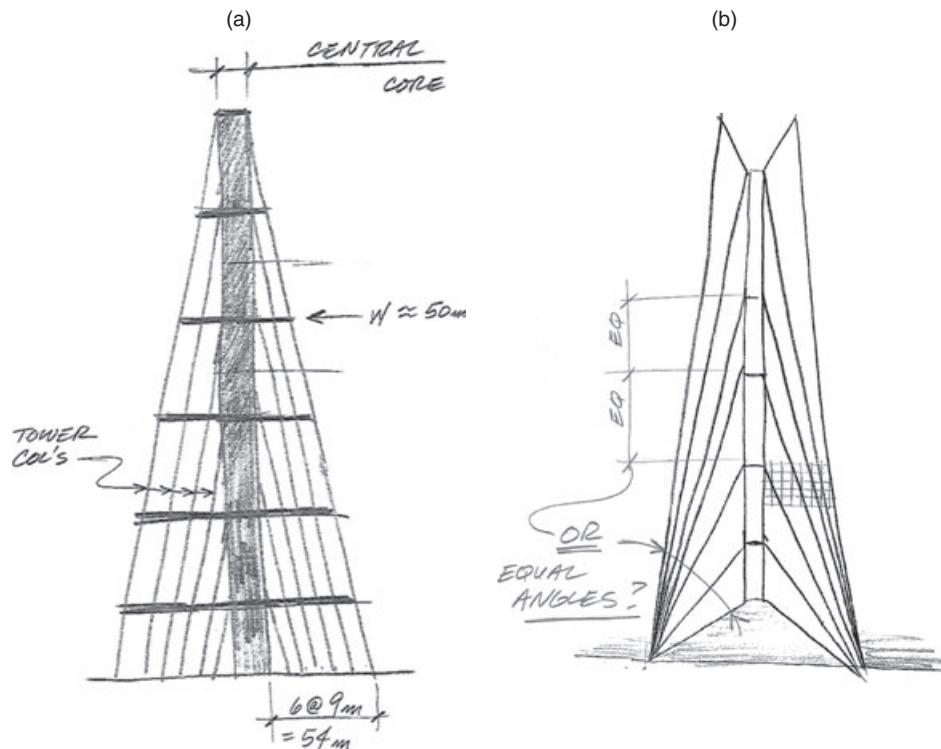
Reaching current structural form. (a) Parallel sloped columns. (b) Sloped columns to one point
